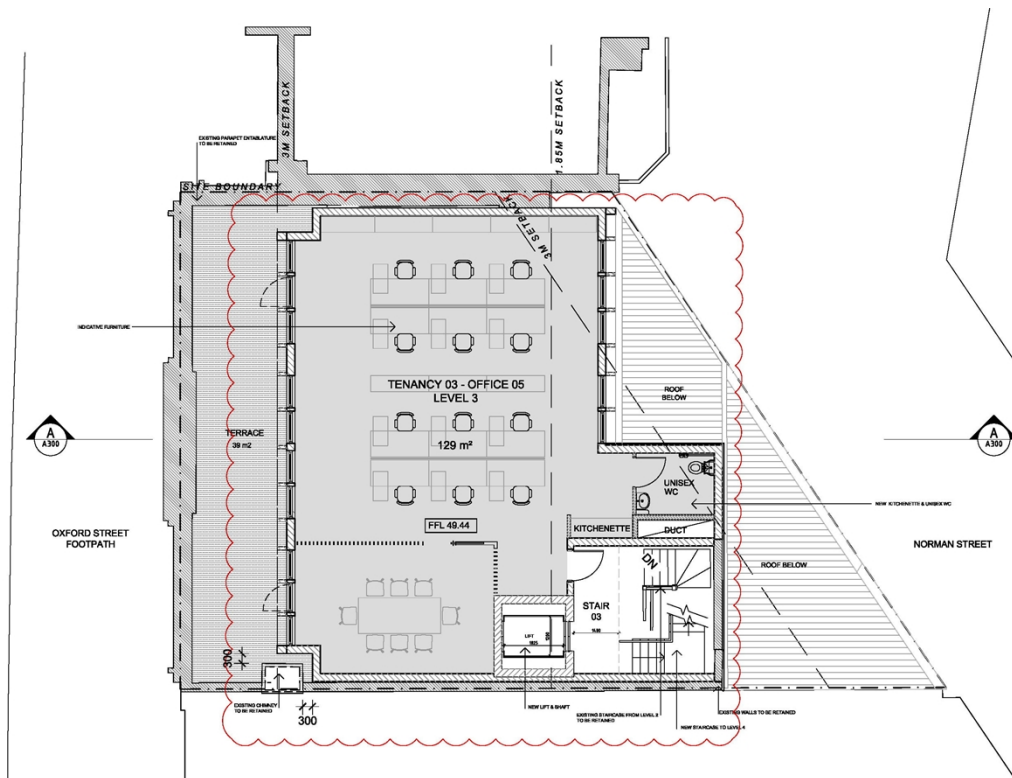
Proposed level 3 floor plan. This floor plan is also typical of proposed level 4.
